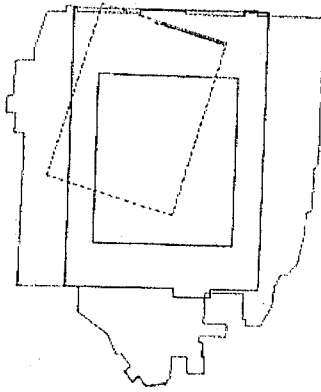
Isfahan, Masjid-i-Jami', ground plan.
